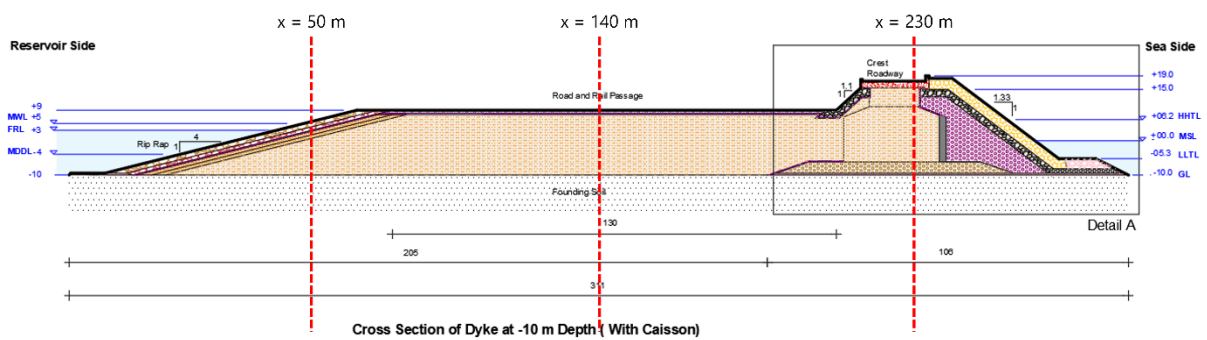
Cross-sections along the -10 m embankment section (with caisson)
